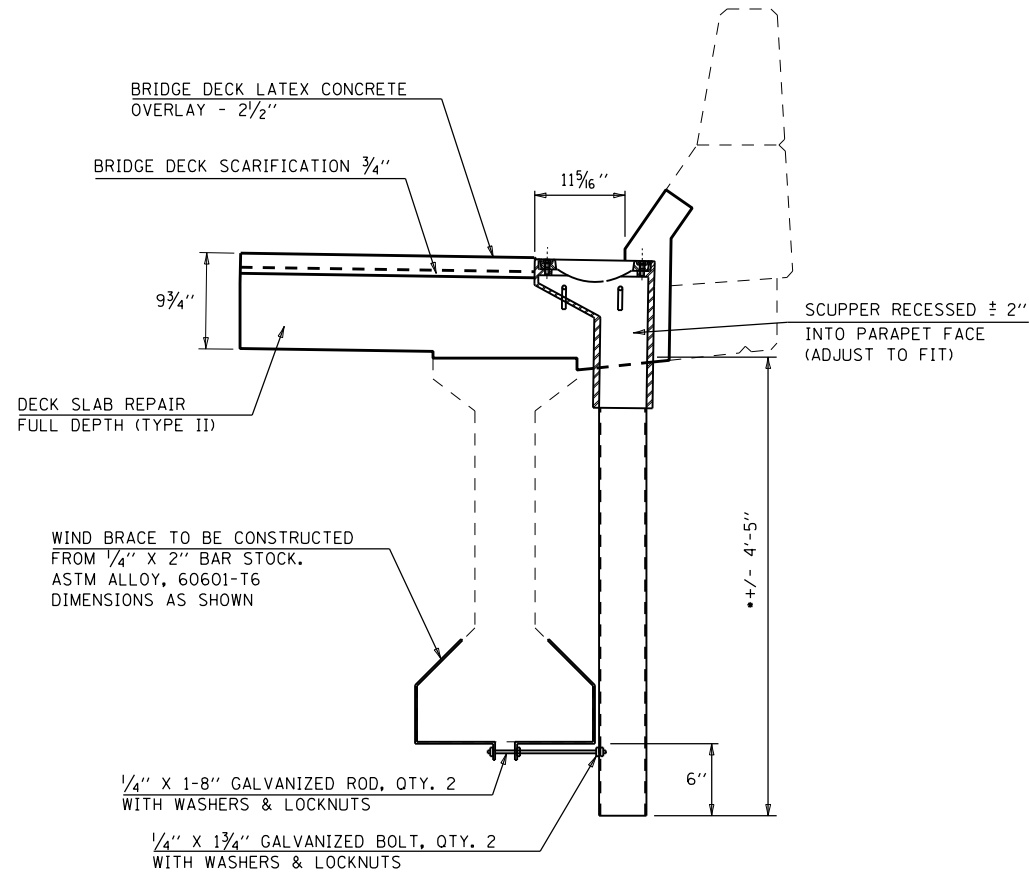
DETAIL OF PROPOSED DRAINAGE STRUCTURES
